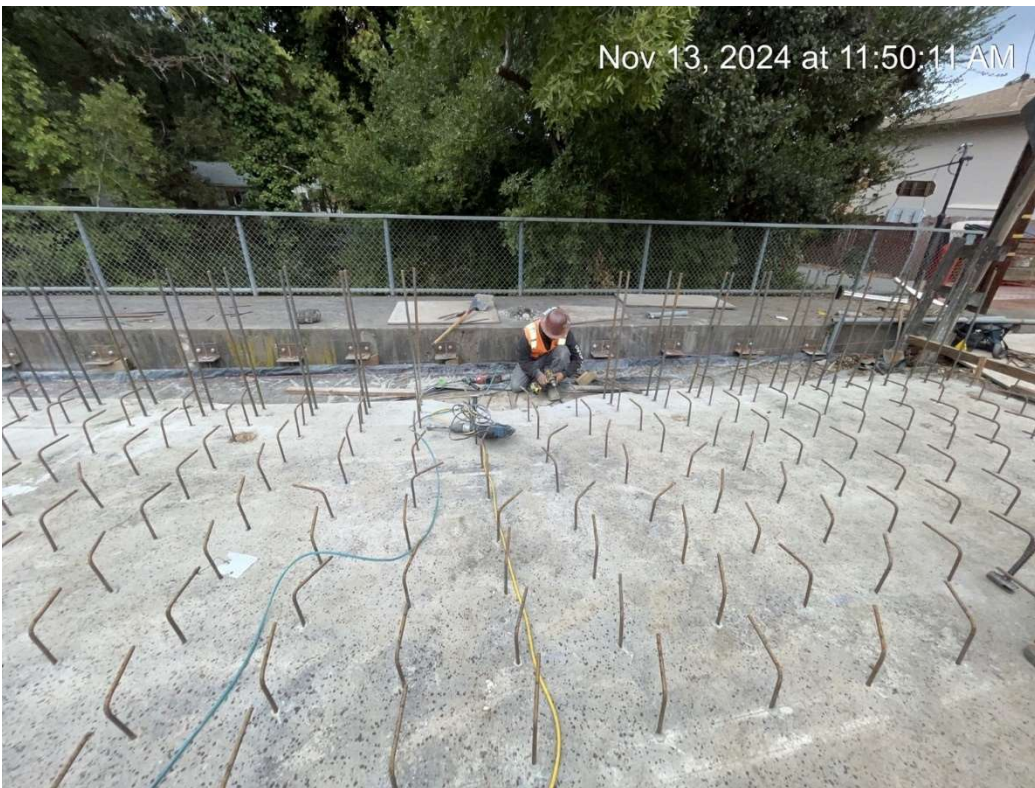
Installing Bridge Drill & Bond Dowels for new sidewalk.
